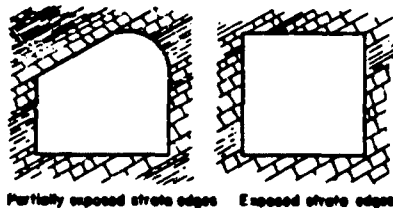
Cross sections of horizontal tunnels driven parallel to strike of inclined bedded formation
